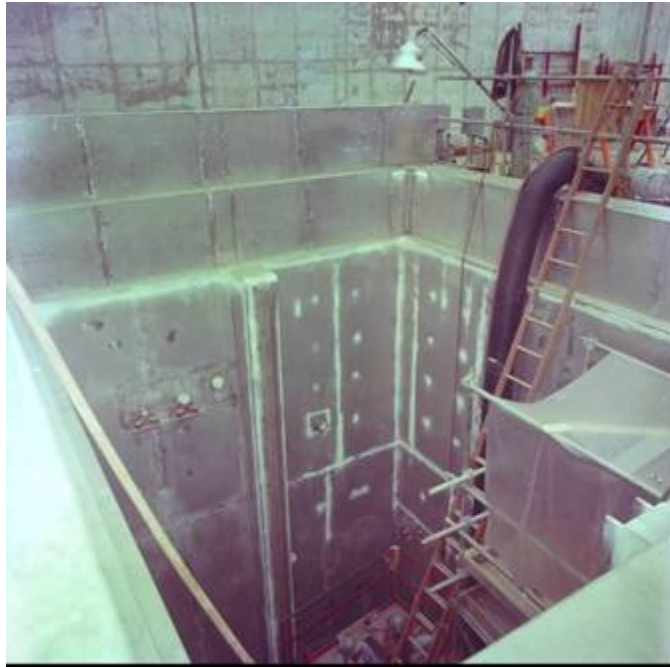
FPP-2 Concrete Vault During Construction (View 2)
